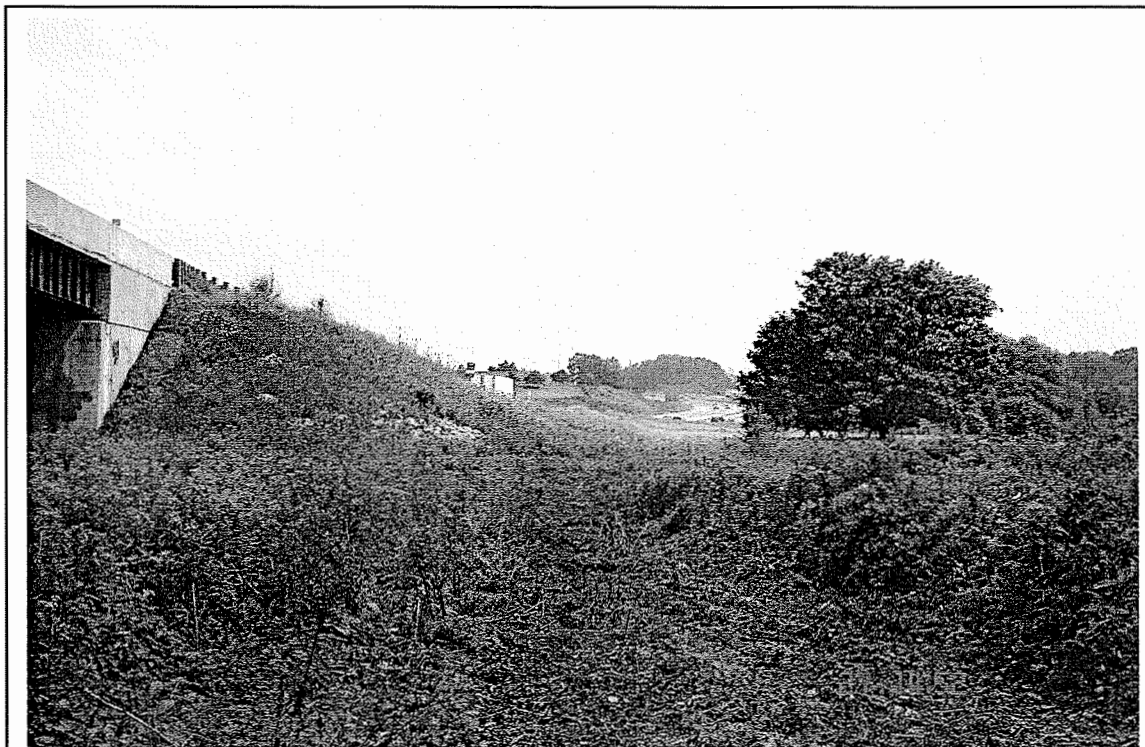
, July 2006 – Looking from flood plain on south side of Grand River towards South Abutment. Existing bridge on left side of photo.
